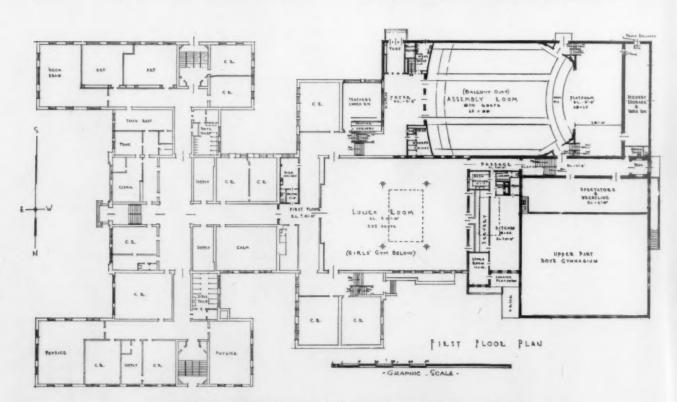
Gienville High School, first floor plan after rehabilitation and addition
